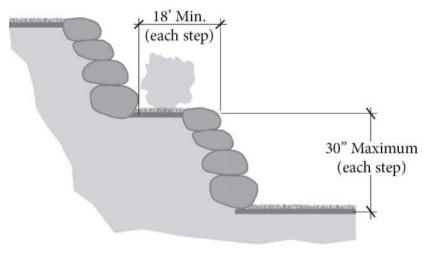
c. Allowable terrace configuration for wall or rockery adjacent to a public sidewalk. Note that this illustration shows a stone wall, but other masonry and concrete walls are acceptable as well.
